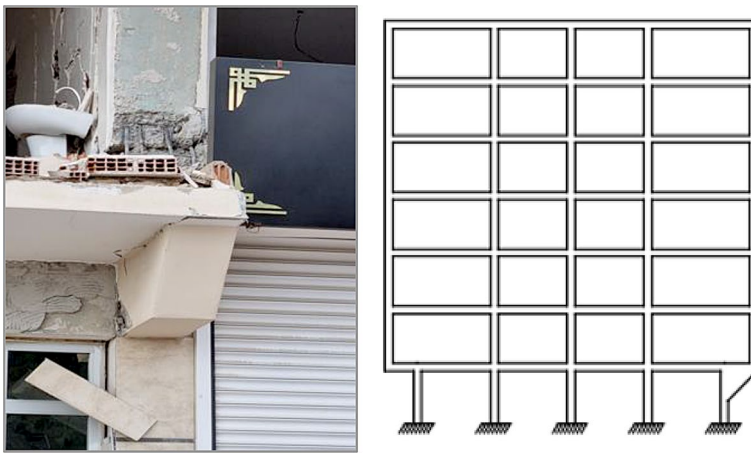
An example of a column connecting on the end of cantilever beams (the right drawing from TBEC 2018)
